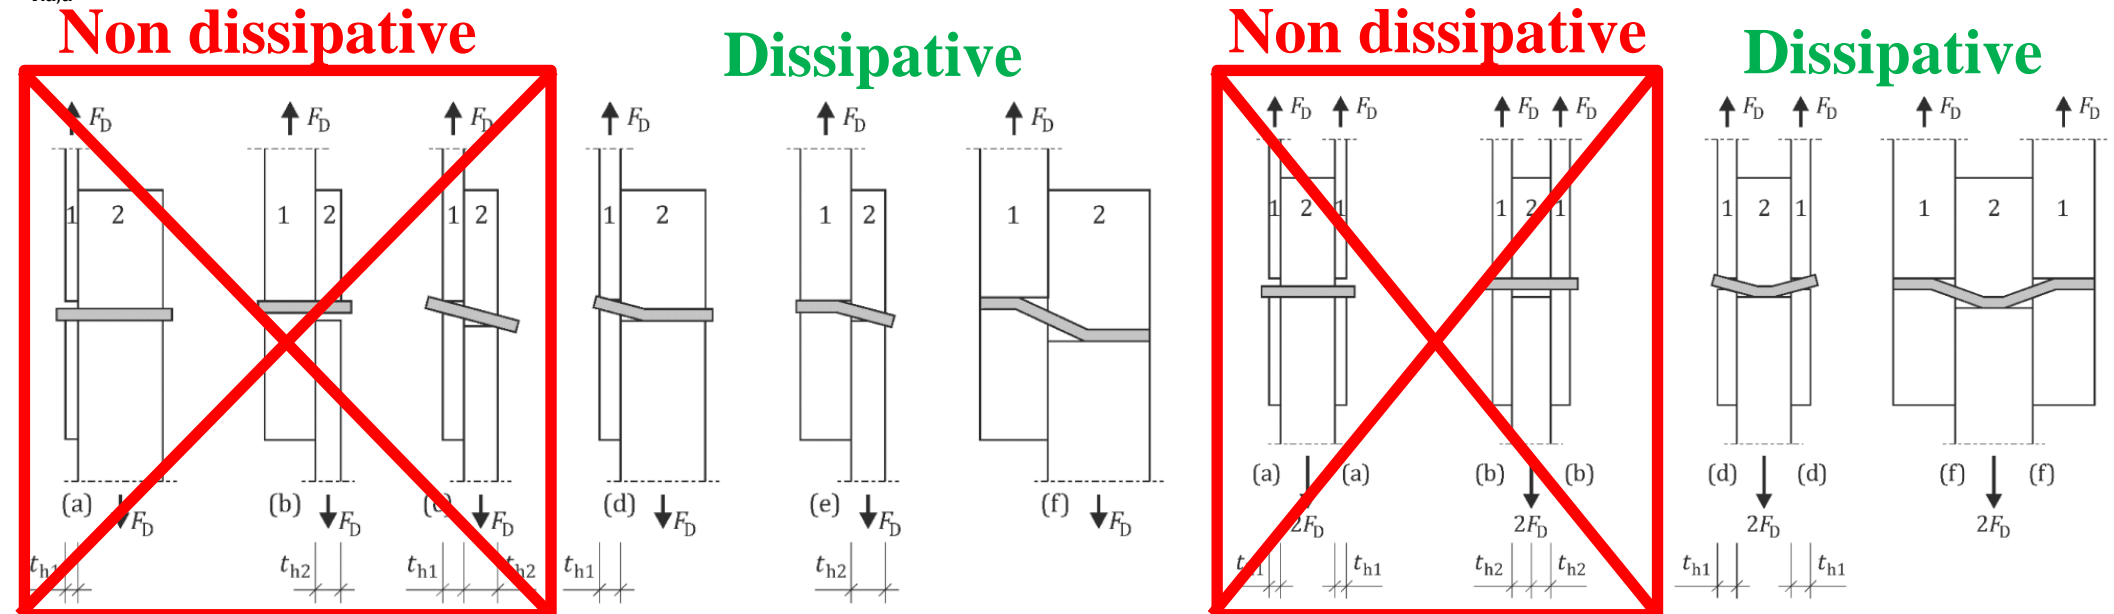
Possible failure modes a) - f) for a fastener loaded in single shear
